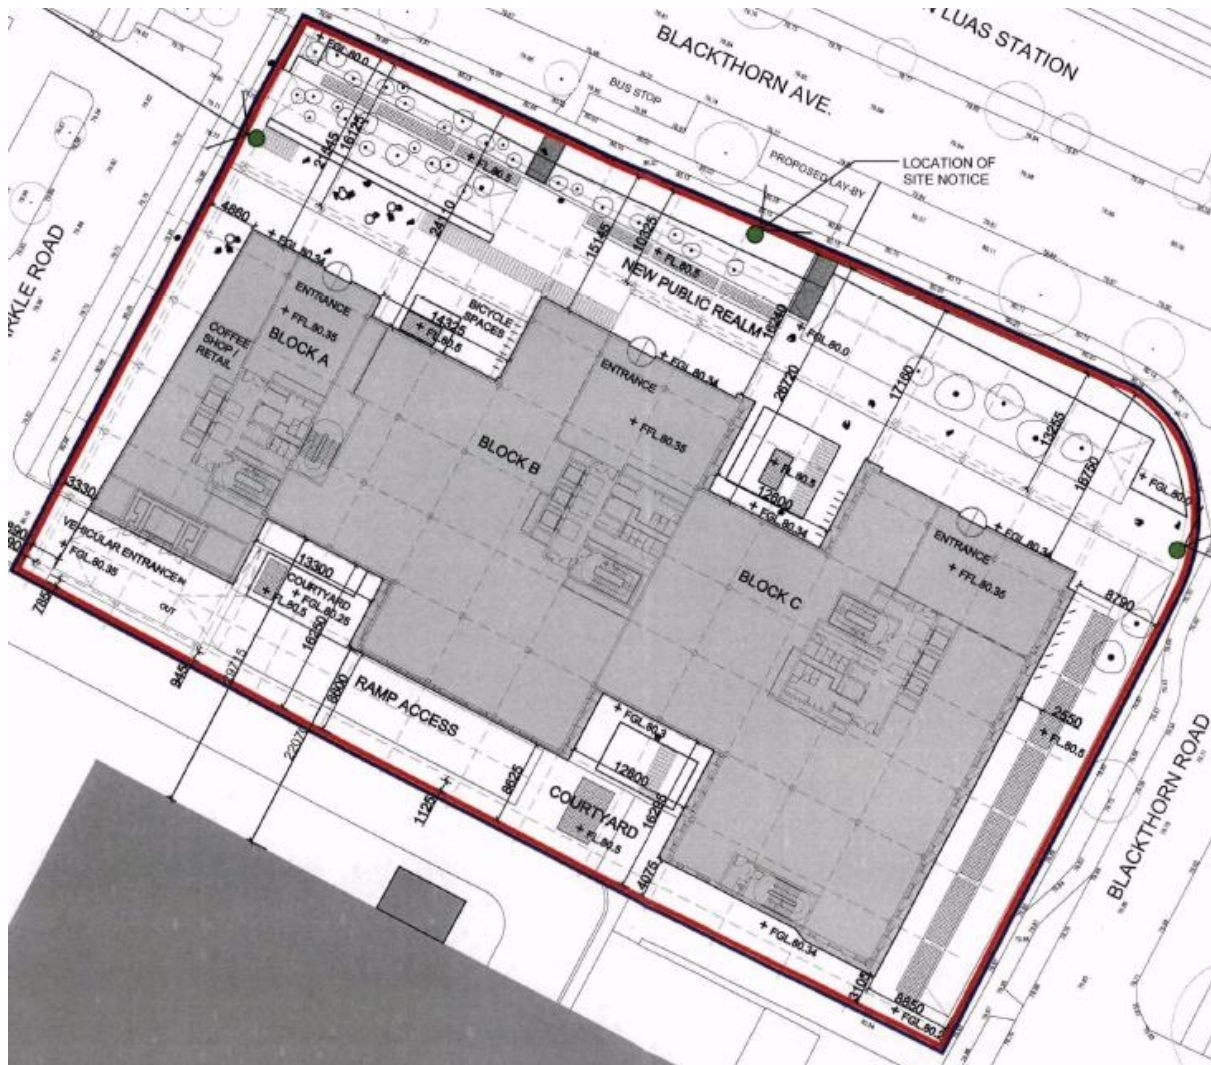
Site layout plan approved under planning application Ref. D15A/0827.
